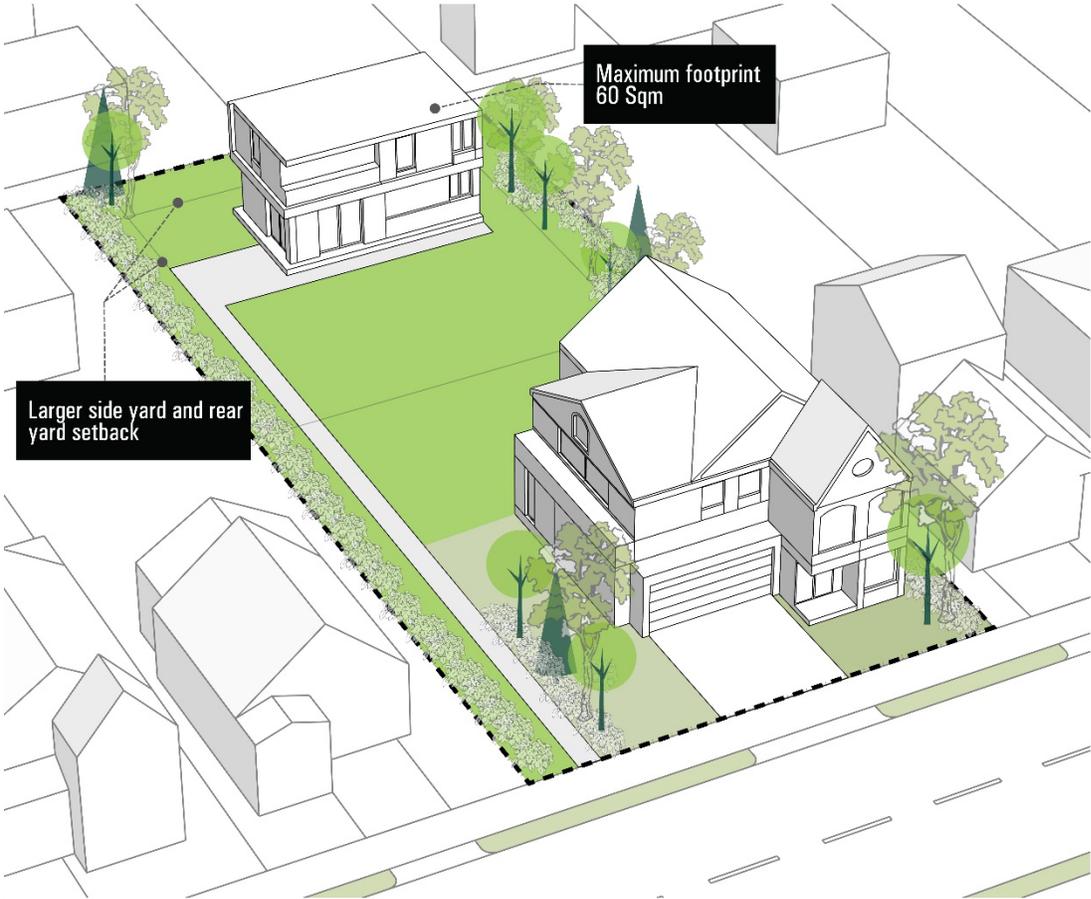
View of garden suite on corner lot 15 metres wide and 36 metres deep
